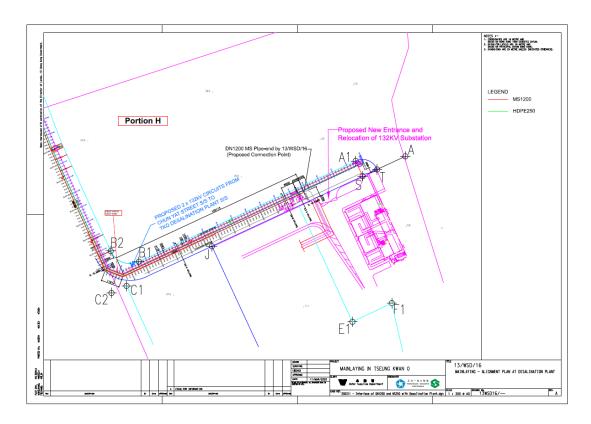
Location Plan for CH.CT 0+07 – 2+58
